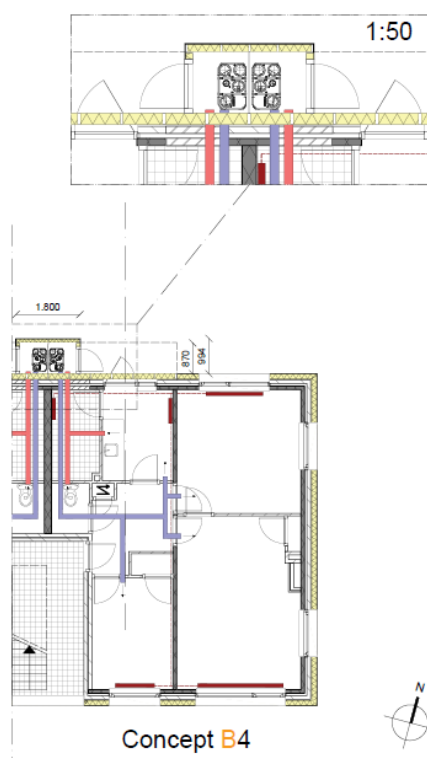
New floorplan Concept B4 with building services, Source: own illustration.
